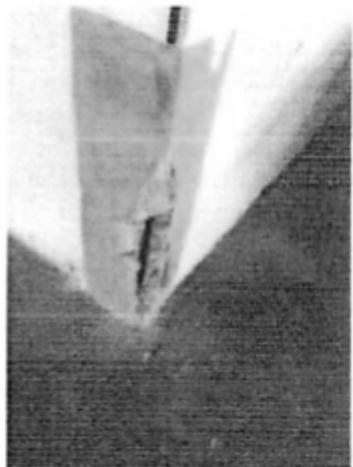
Typical cracking and spalling at parking garage columns
